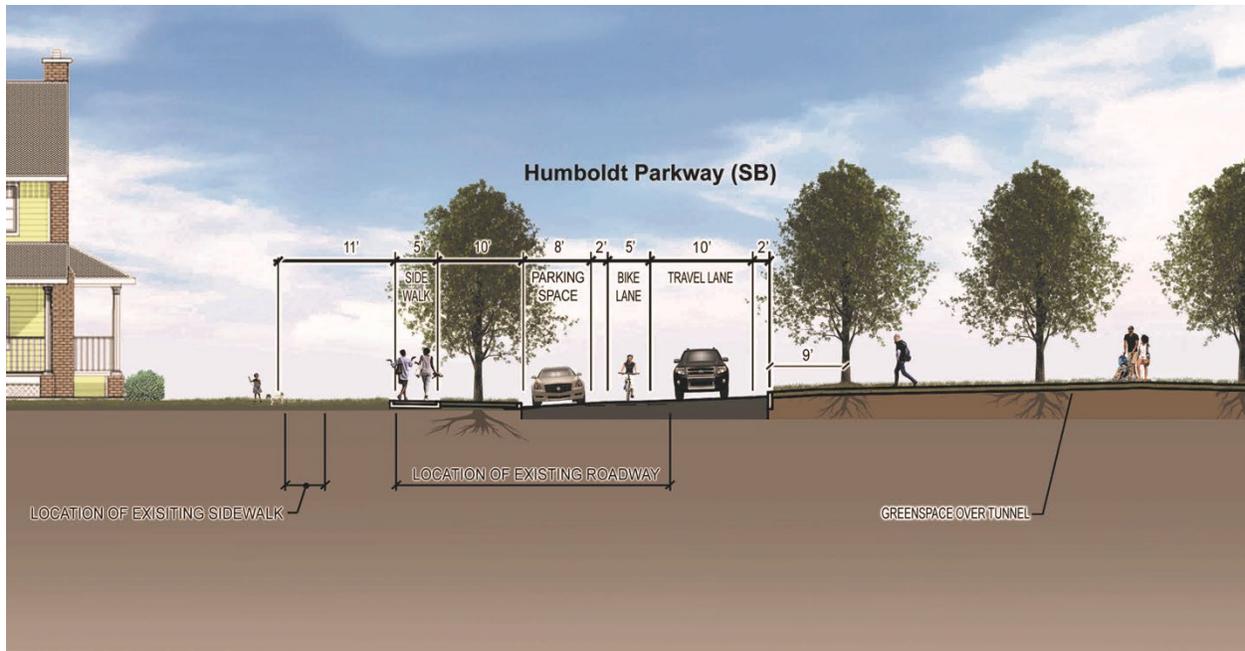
Humboldt Parkway typical section under the Build Alternative looking north.
